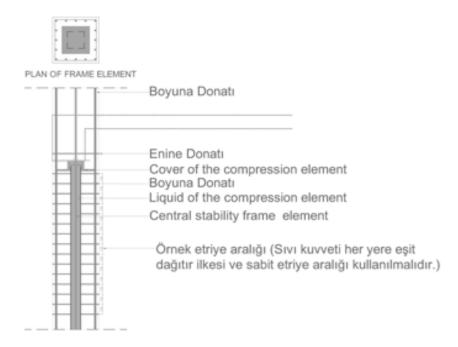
Integration scheme of the internal strength design for the columns and beams in reinforcement concrete systems.
